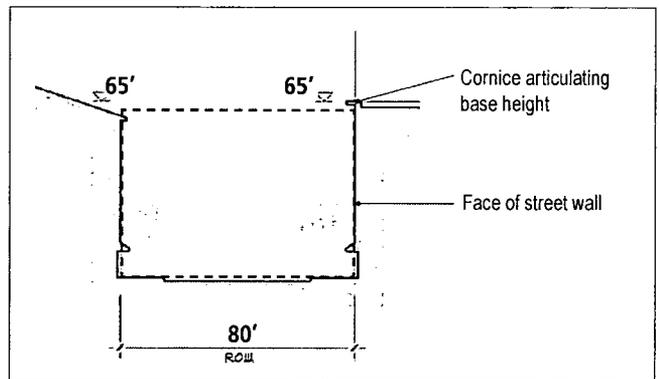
Street section with 3:4 proportions, with cornice articulation defining building base height.
